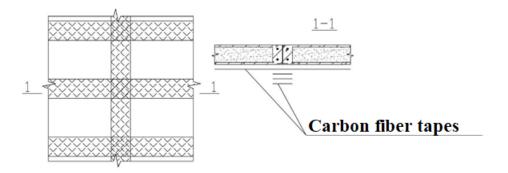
Scheme of reinforcing the floor after non-design loads. Strengthening the overlap in the area of negative moments
